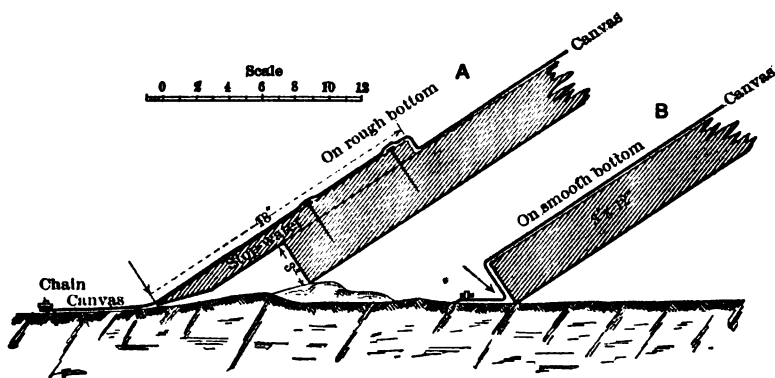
DETAILS OF CANVAS AND PLANK BULKHEAD.
